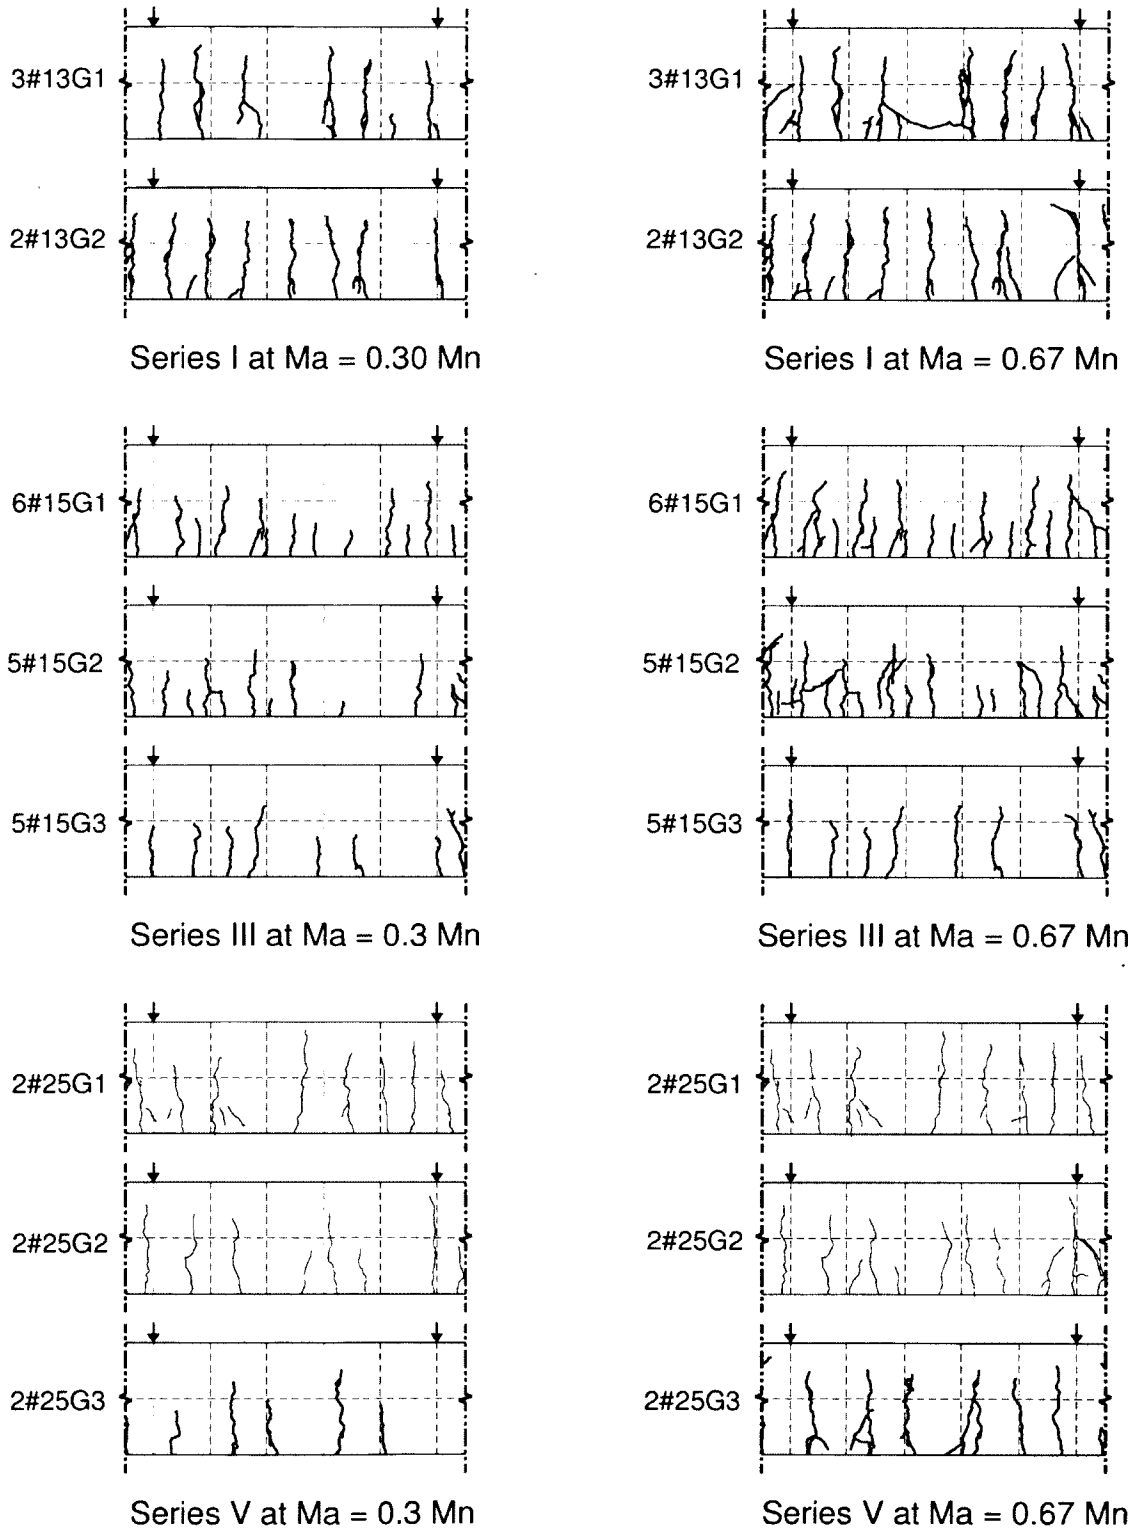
shows the crack patterns of tested GFRP reinforced concrete beams at load levels
